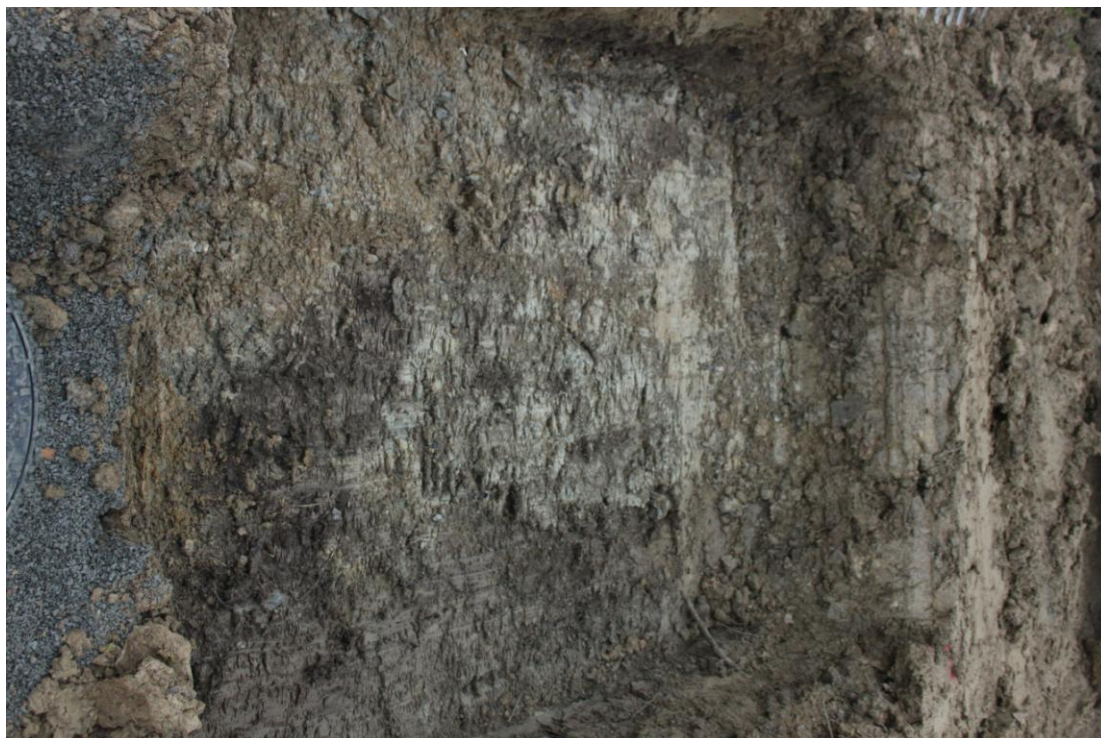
AD005-D5-094 - Excavation of septic tank pit.
